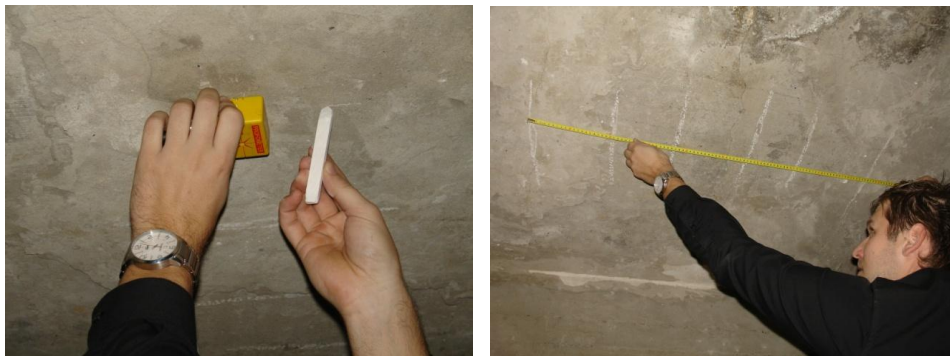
Position and marking of the reinforcement on the flooring plate of the ceiling using a magnetic indicator – Profometer
